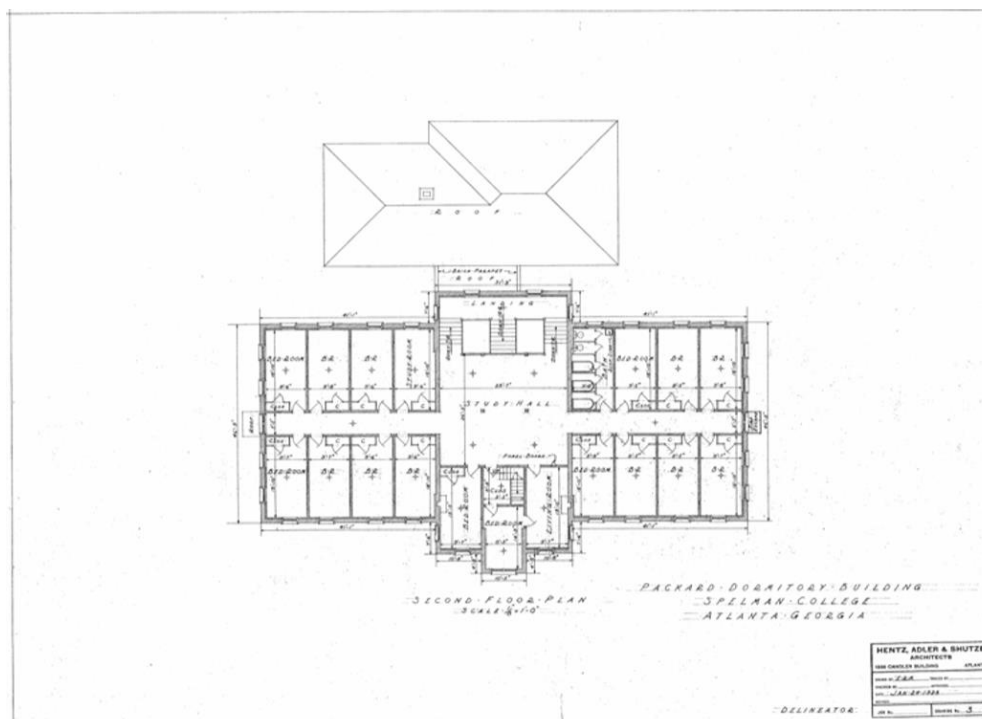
Second-floor floorplan of Packard Hall. The second floor was home to the Wollaston Room and the Dickenson Room. (Floorplan, *Spelman College Campus Heritage Plan* 2005, Clement and Wynn Program Managers, Atlanta, Georgia) 67.
